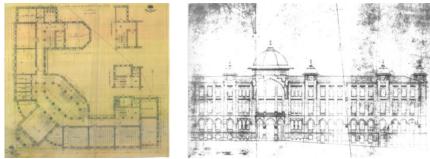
a) Gedikpaşa Engineer School Ground Floor Plan [51], b) Gedikpaşa Engineer School Facade [42]
